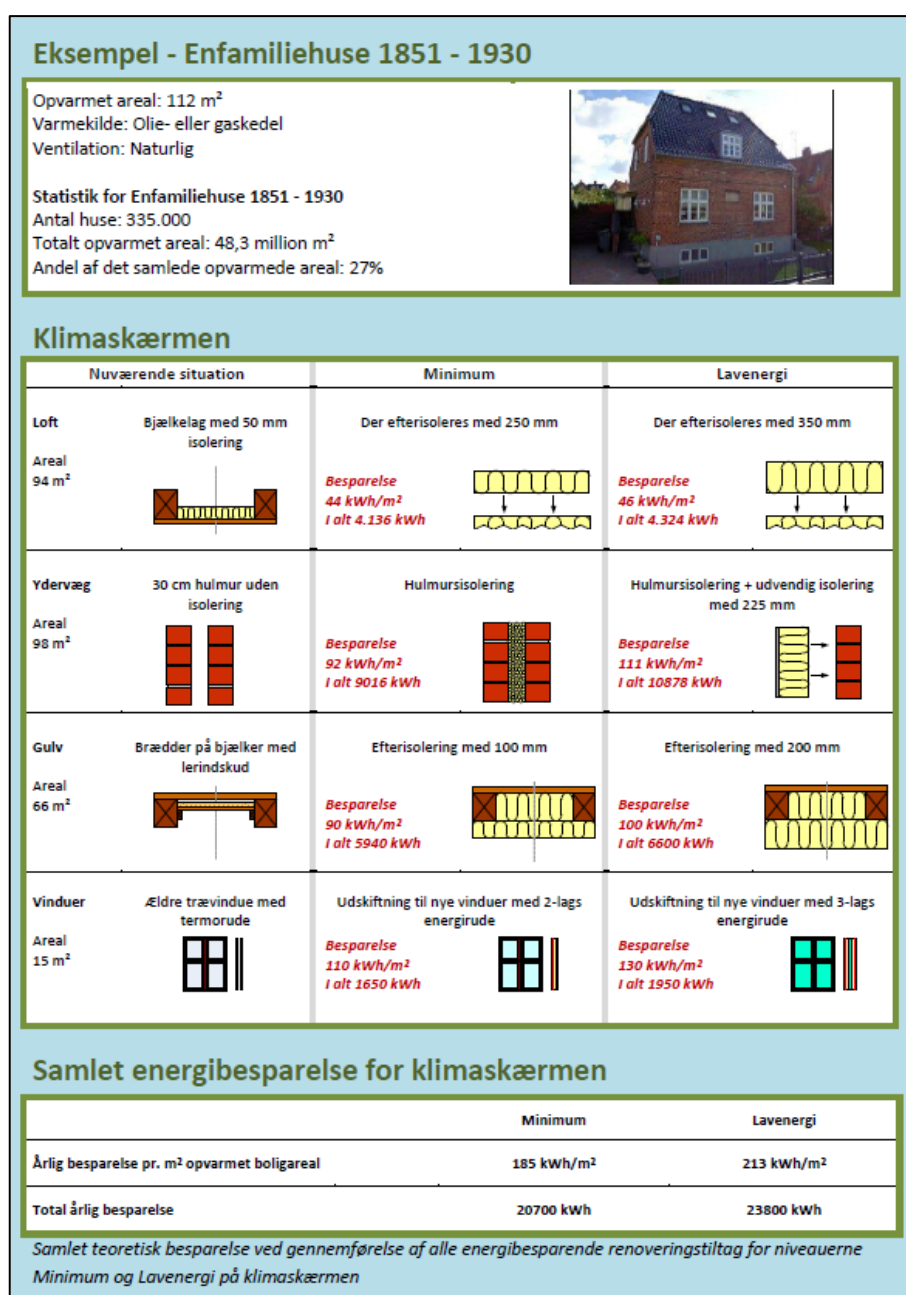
Example of a display sheet showing the building envelope constructions of one of the real example buildings (Single-family house from 1851 – 1930).
